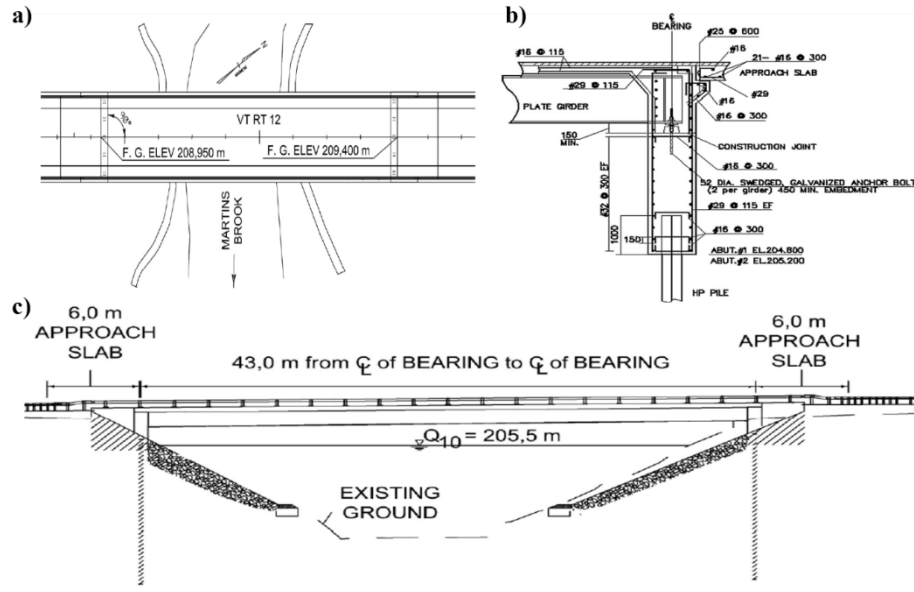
Bridge: (a) Plan view, (b) abutment cross-section, and (c) elevation view (Civjan et al. 2013)
